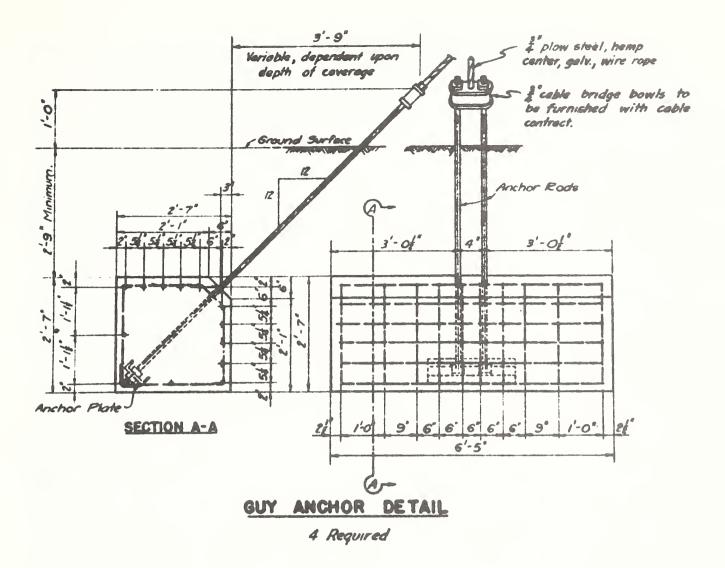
This particular anchor plan is for the standard timber lookout tower, CT-1 series, in the 119 feet version. Anchor plans for other types were very similar.
